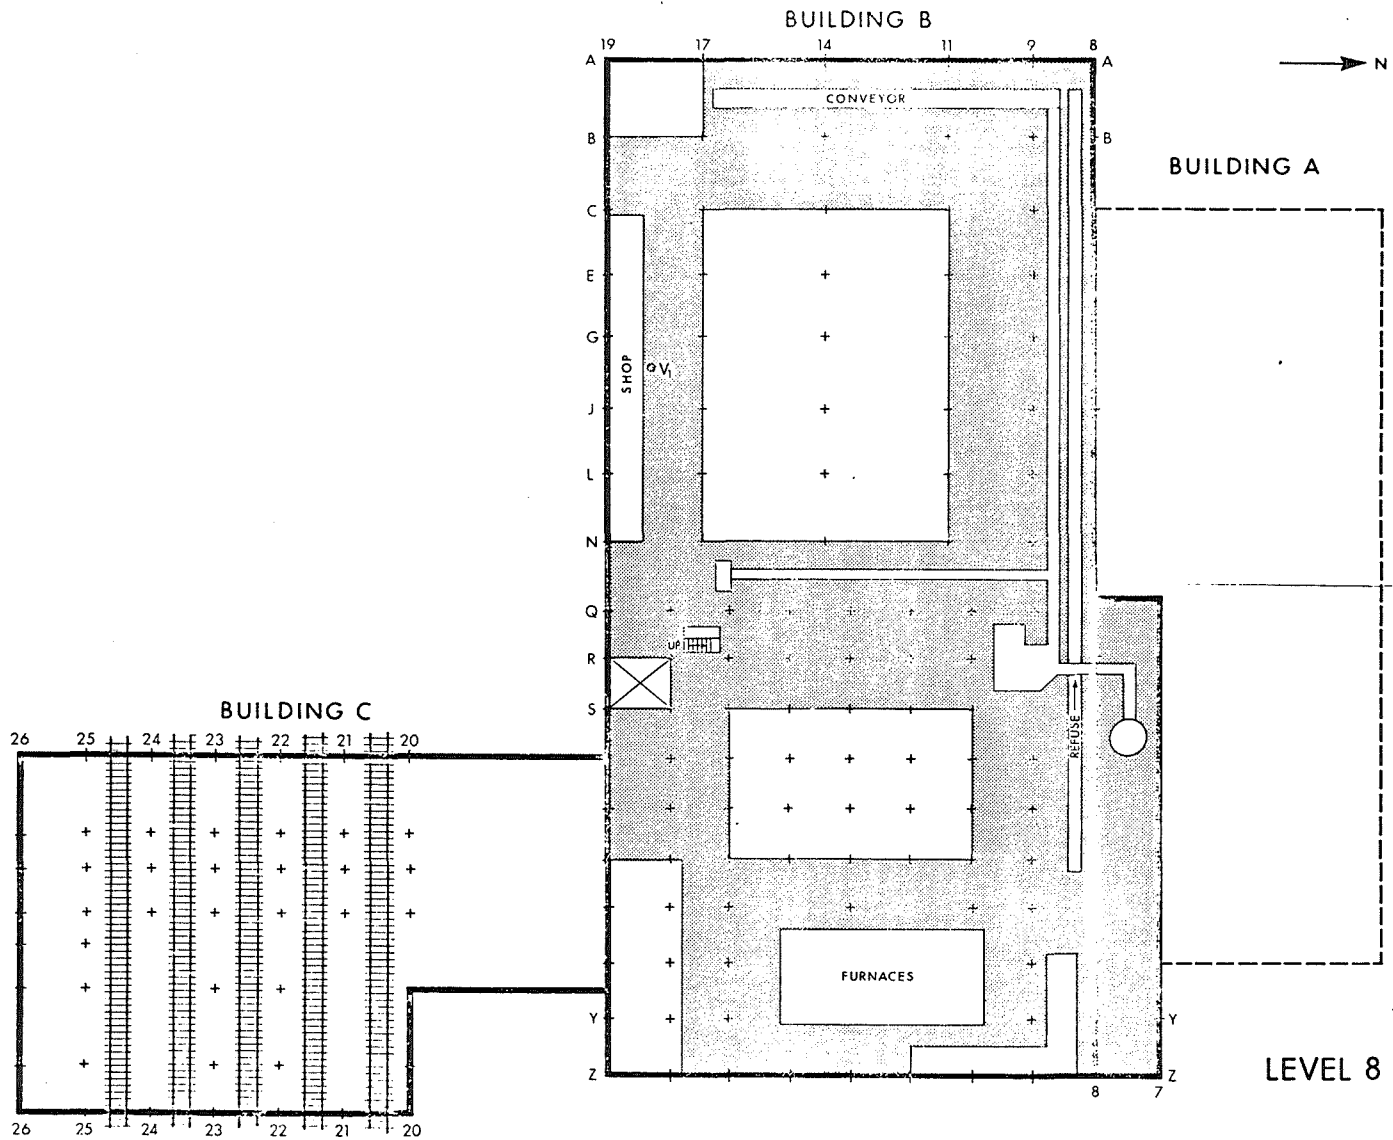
GEORGETOWN PREPARATION PLANT. FLOOR PLAN OF LEVEL 8.
